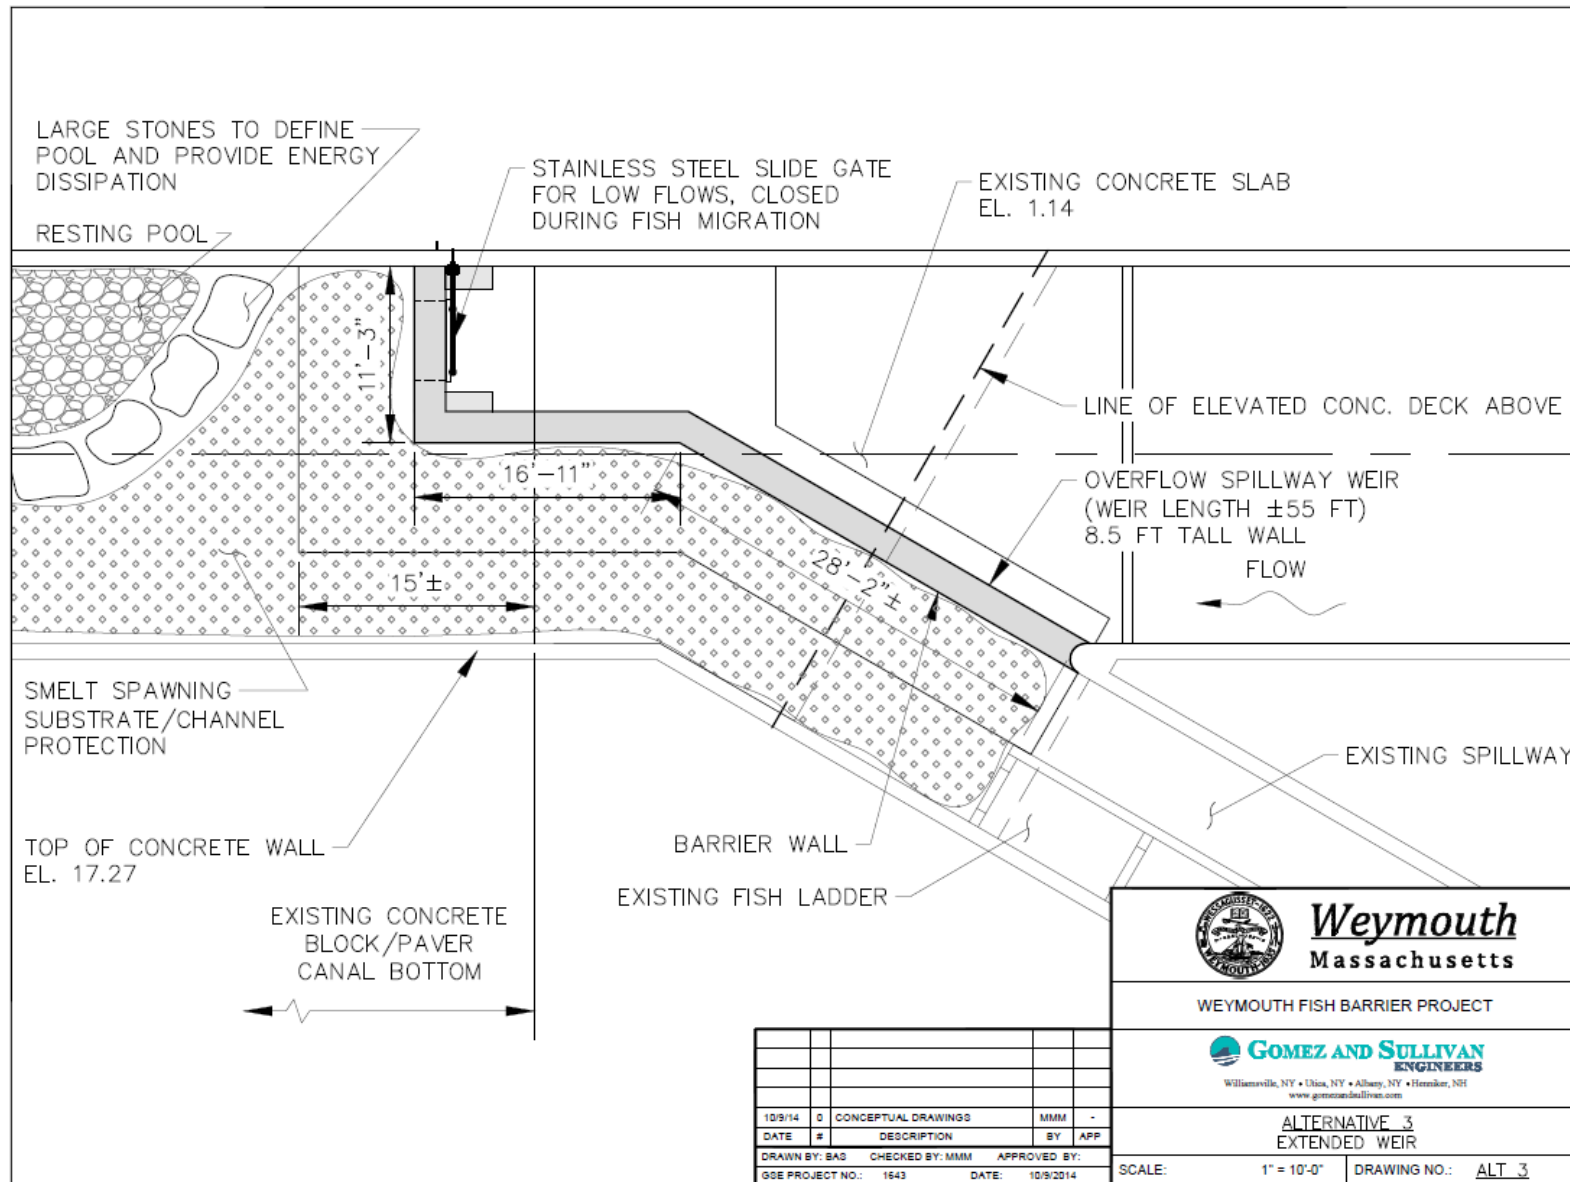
Concept Design Alternative #3 – Extended Weir
